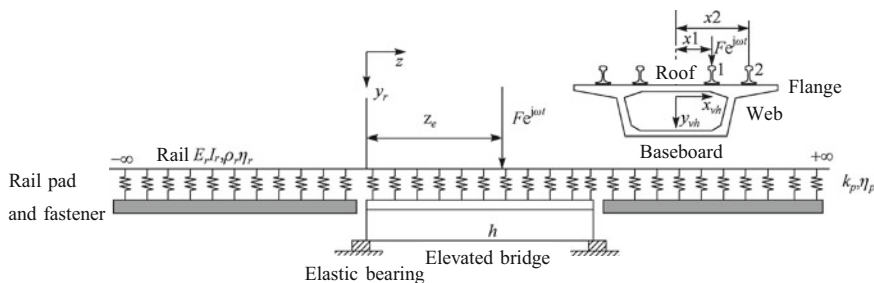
The analytic model of the elevated track-bridge coupling system
